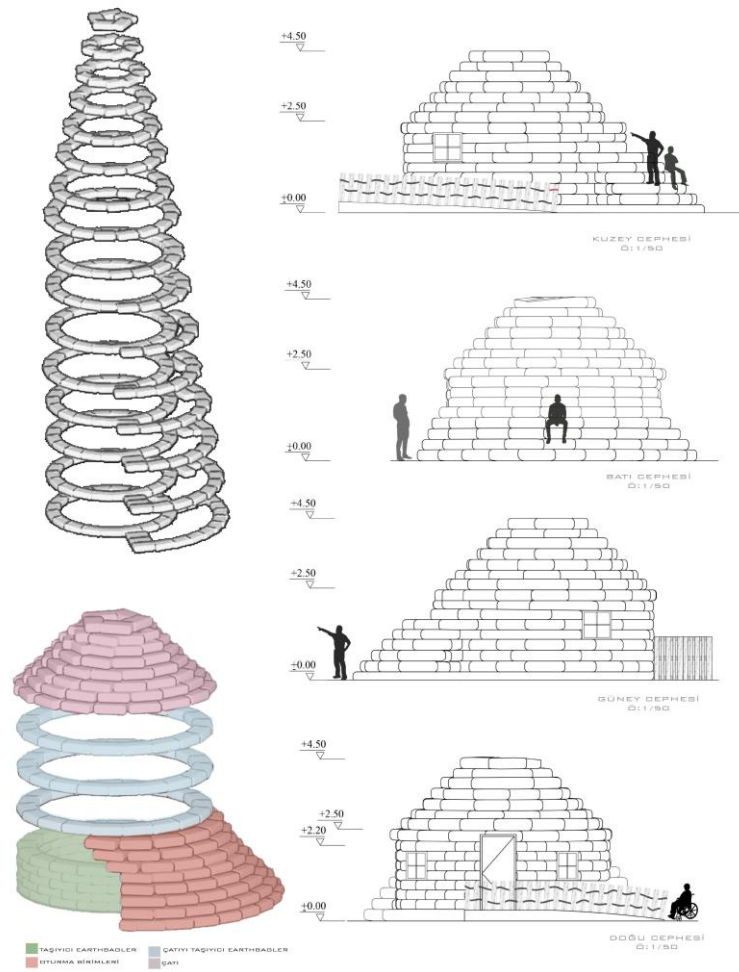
Alternative 2: Earthbag-roofed changing room and tribune elevation and perspective
